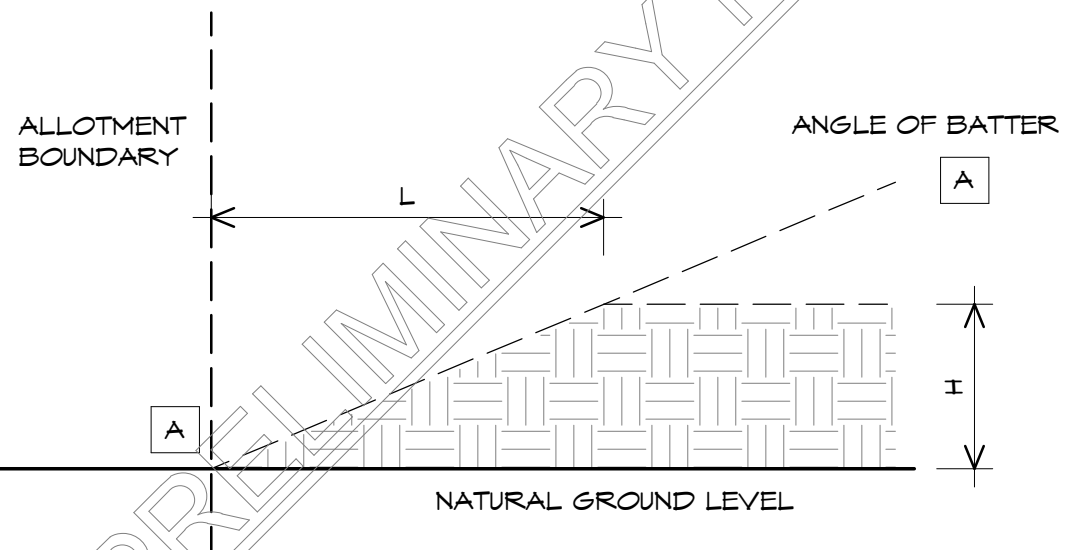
B SITE CUT AND FILL USING UN-RETAINED EMBANKMENTS - FILL COMMENCING AT THE ALLOTMENT BOUNDARY OR AFFECTING AN ADJOINING PROPERTY
